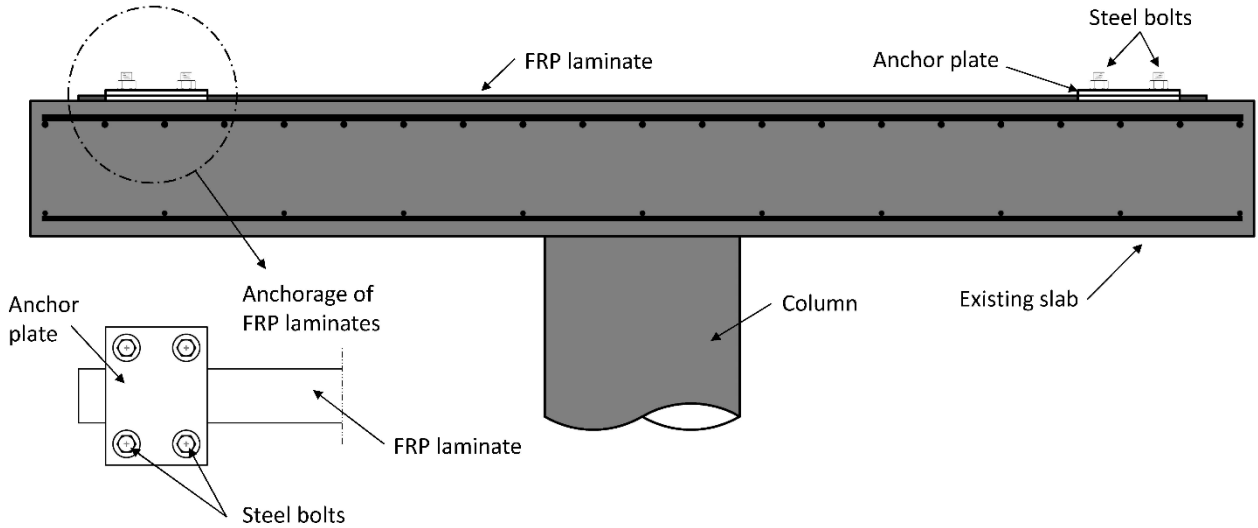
prestressing system for flexural strengthening: FRP strips and anchor plate (adapted from Abdullah et al. [22])
